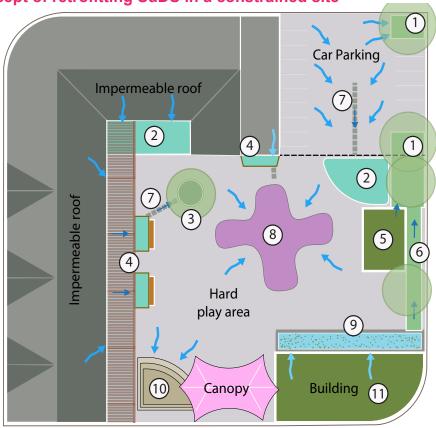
Concept of retrofitting SuDS in a constrained site
